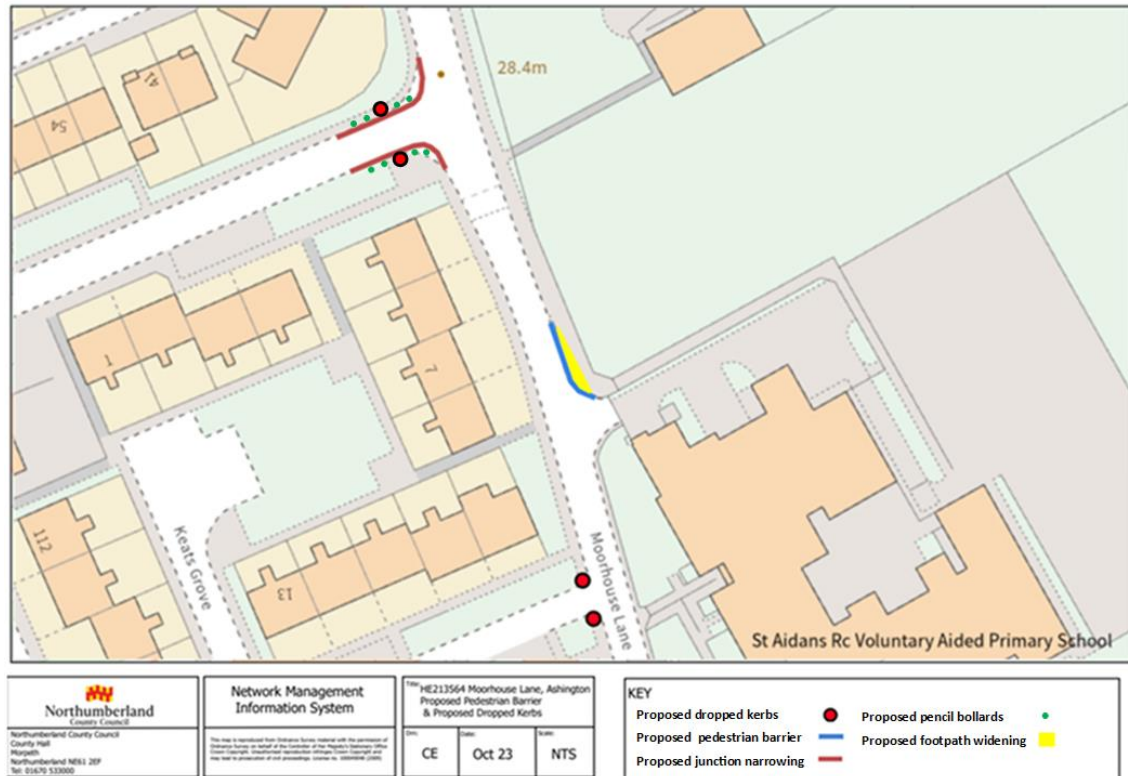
Proposed junction narrowing, dropped kerbs, pencil bollards, footpath widening and new pedestrian barriers around St Aidans RC Primary School and Thomas Bewick Academy
